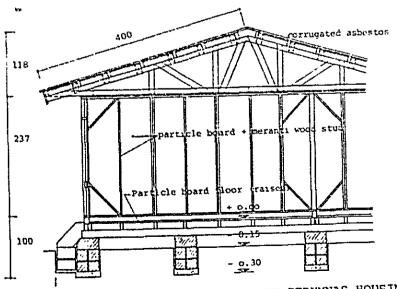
EXISTING WALL SYSTEM OF PERUMNAS HOUSING
